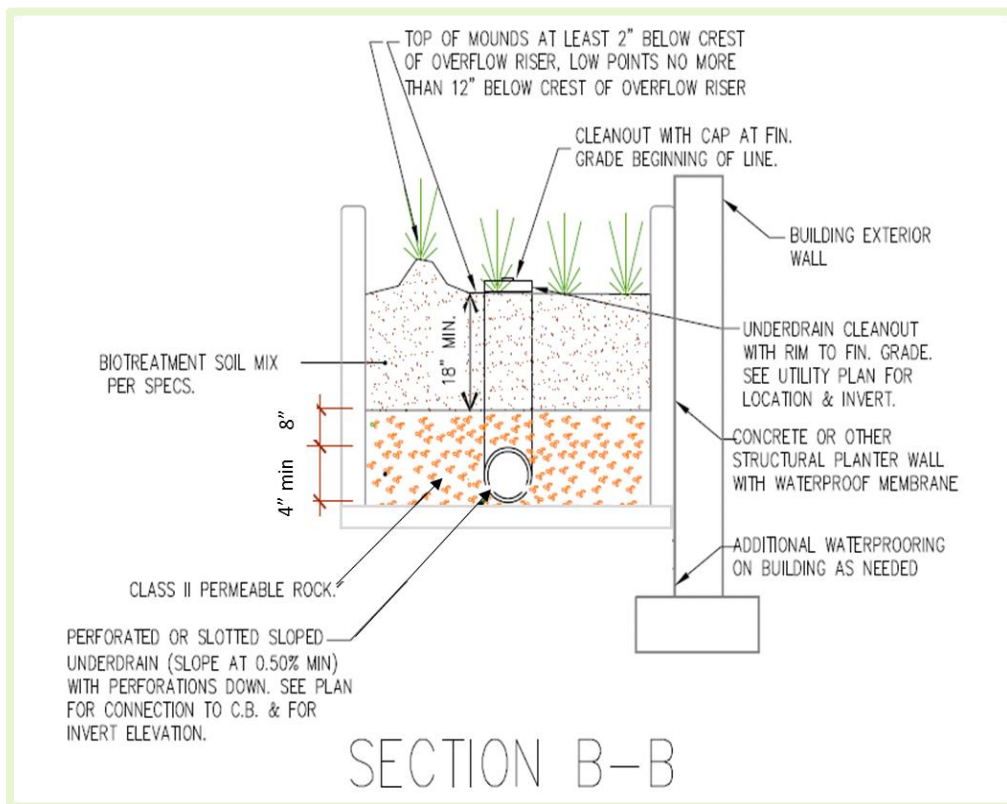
Cross section B-B of flow-through planter, shows cross section of underdrain
